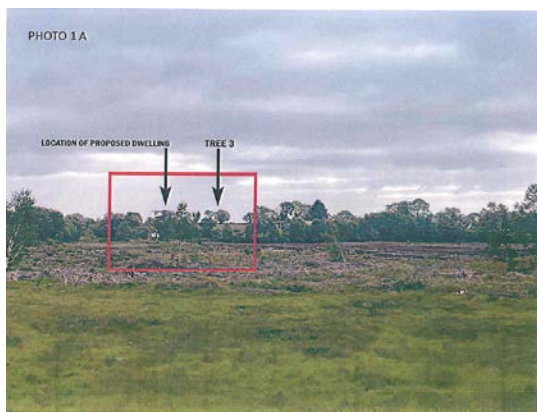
Site identified and agent has superimposed dwelling in view from Derryloughan Road/Ferry Road junction.
